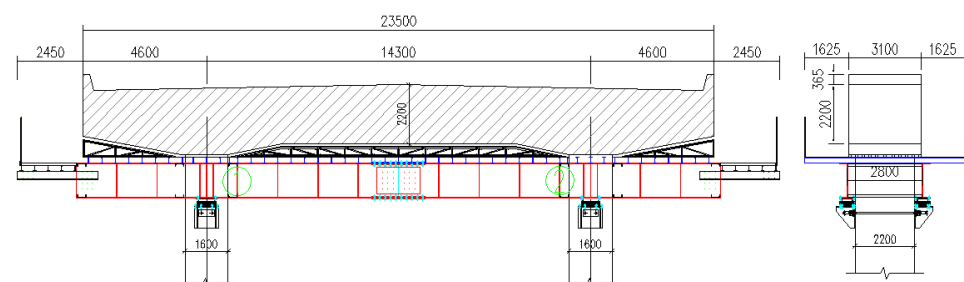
Longitudinal and cross-sectional views of the bent cap support (unit: mm)
